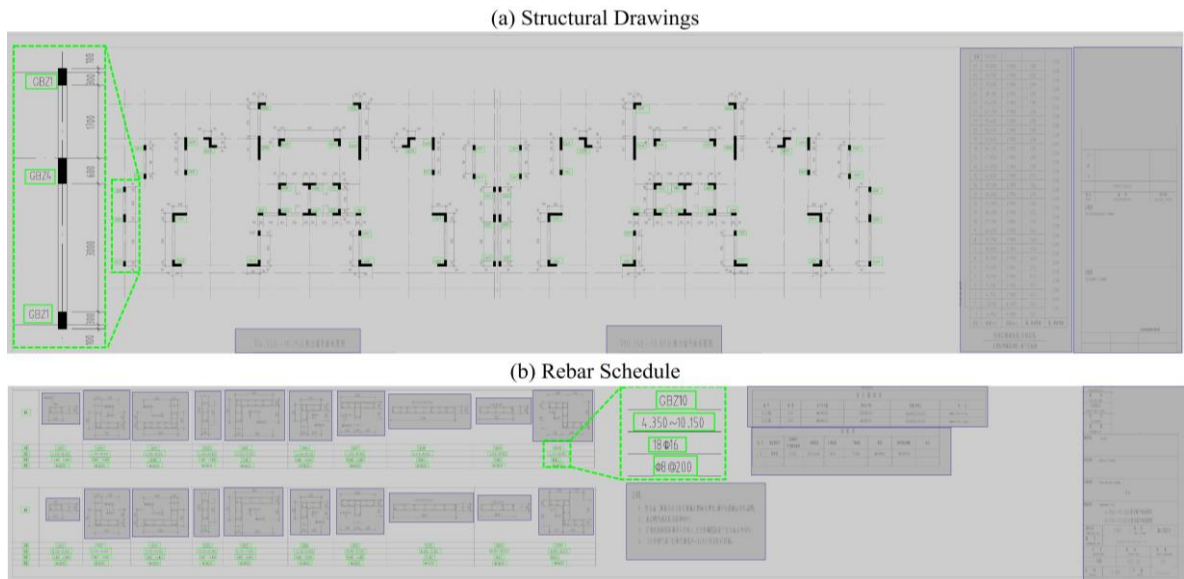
Example of structural engineering drawings: (a) structural construction drawing; (b) rebar detail schedule
